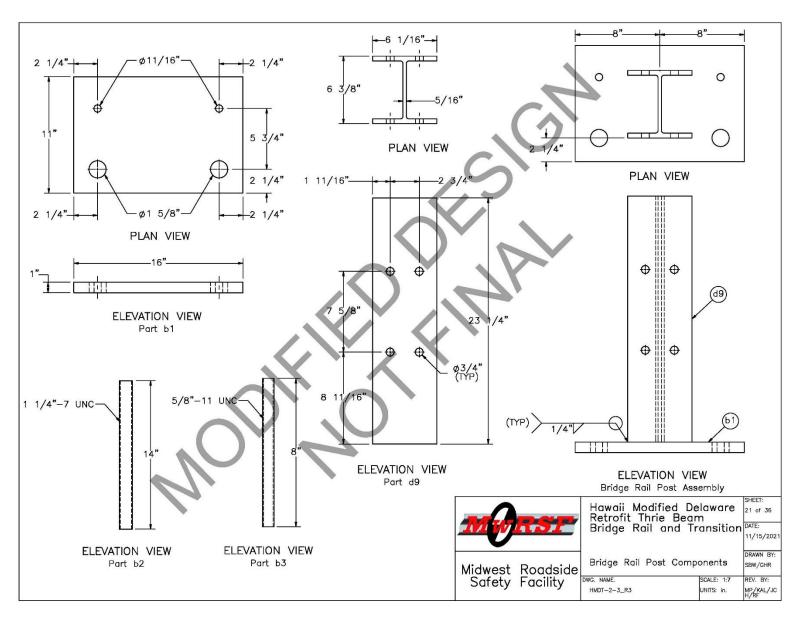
Bridge Rail Post Components, Test Nos. HMDT-2 and HMDT-3
